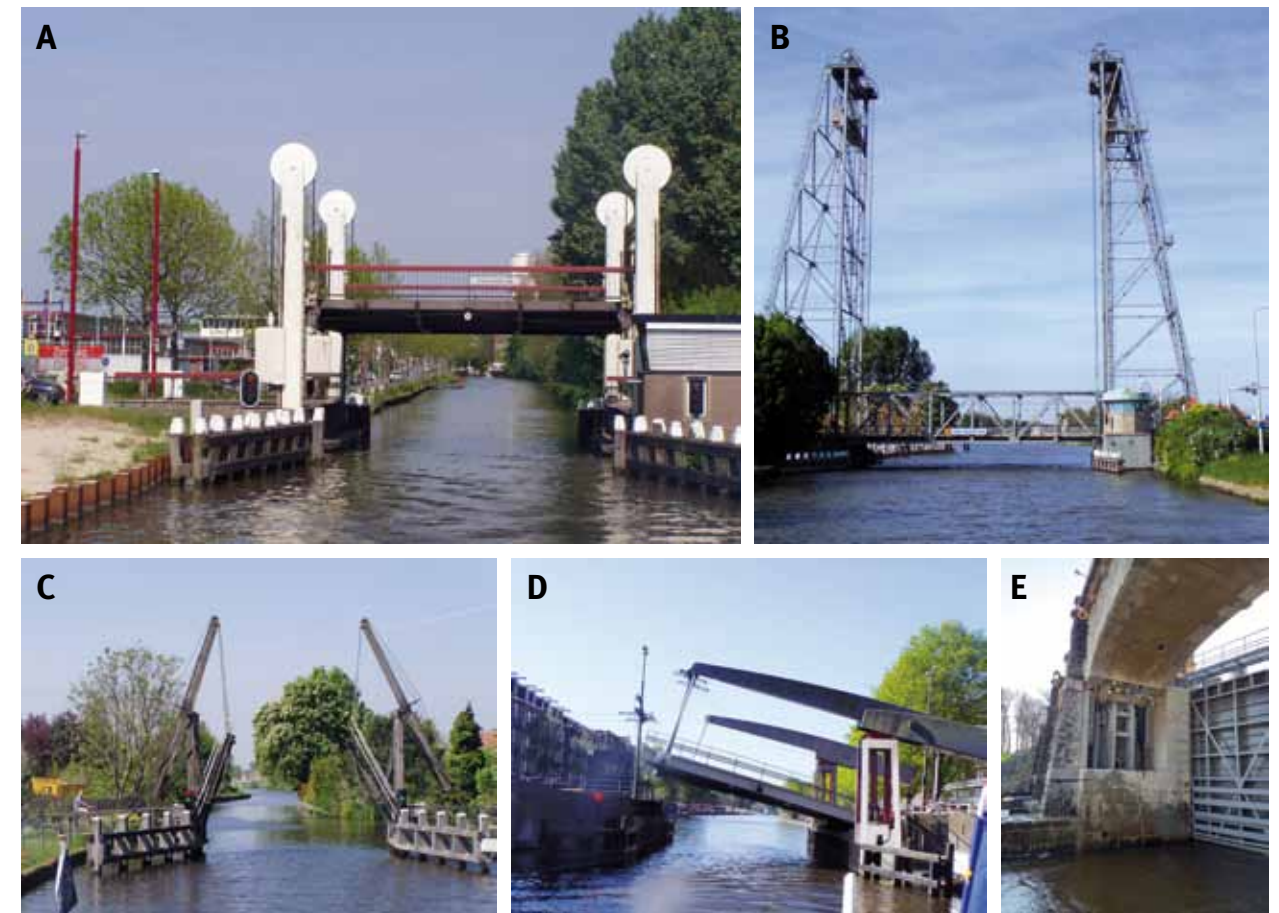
Moveable bridges of various structures: (A) and (B) with counterweight, raised with a road in the horizontal position; (C), (D) bascule bridges; (E) hydraulic bridge on the reconstructed lock Hořín. Photograph (A)–(D) by Vít Forejtník, 2007 (Netherlands); (E) by Otakar Hrdlička, 2021.
